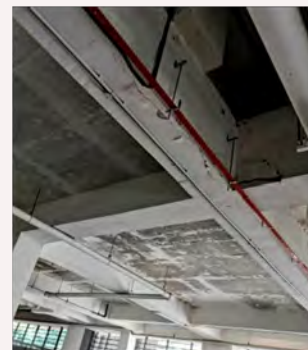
Accelerated corrosion to rebars and cracking of concrete beams under a swimming pool of a 4 year old condominium in Kuala Lumpur
